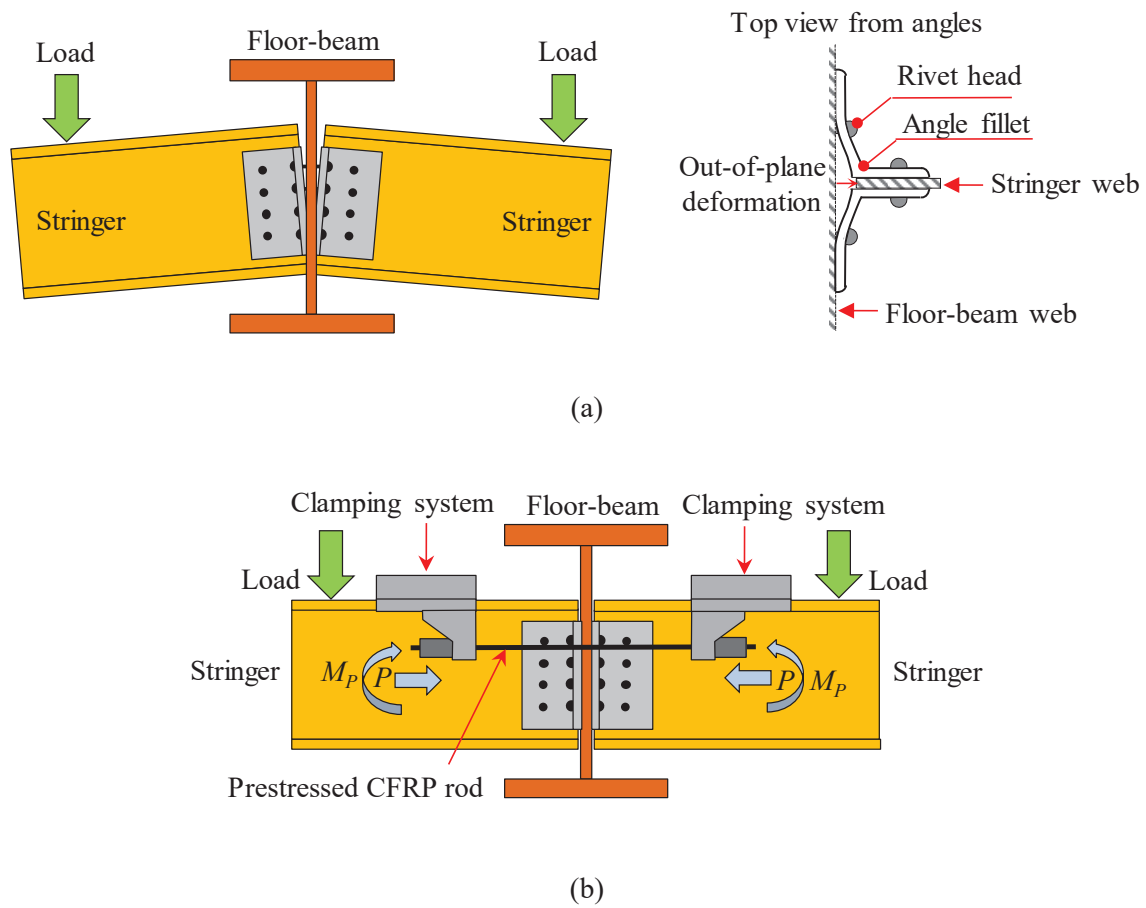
Out-of-plane deformation in stringer-to-floor-beam connections: (a) Out-of-plane deformation due to superimposed load on the stringers and the potential failure locations in the connections; (b) Concept of the proposed strengthening system to reduce out-of-plane deformation.
